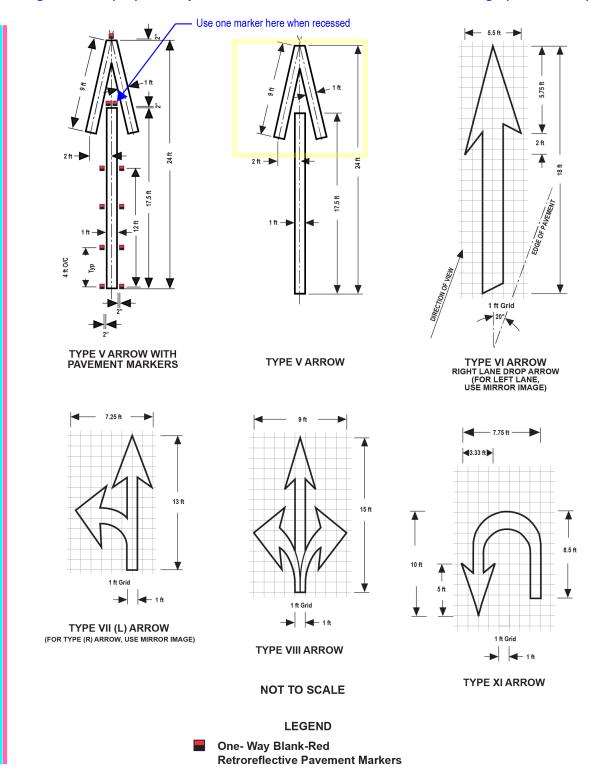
B-24 (CA). Examples of Standard Arrows for Pavement Markings (Sheet 2 of 8)
